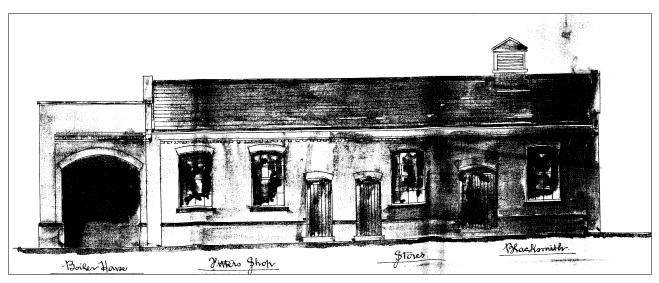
North elevation of the 1889 adopted proposal for the replacement of the Frit Kiln, Mixing House, Stores and Plaster House (see Figure 1). The Boiler House lies to the left.¹⁴
